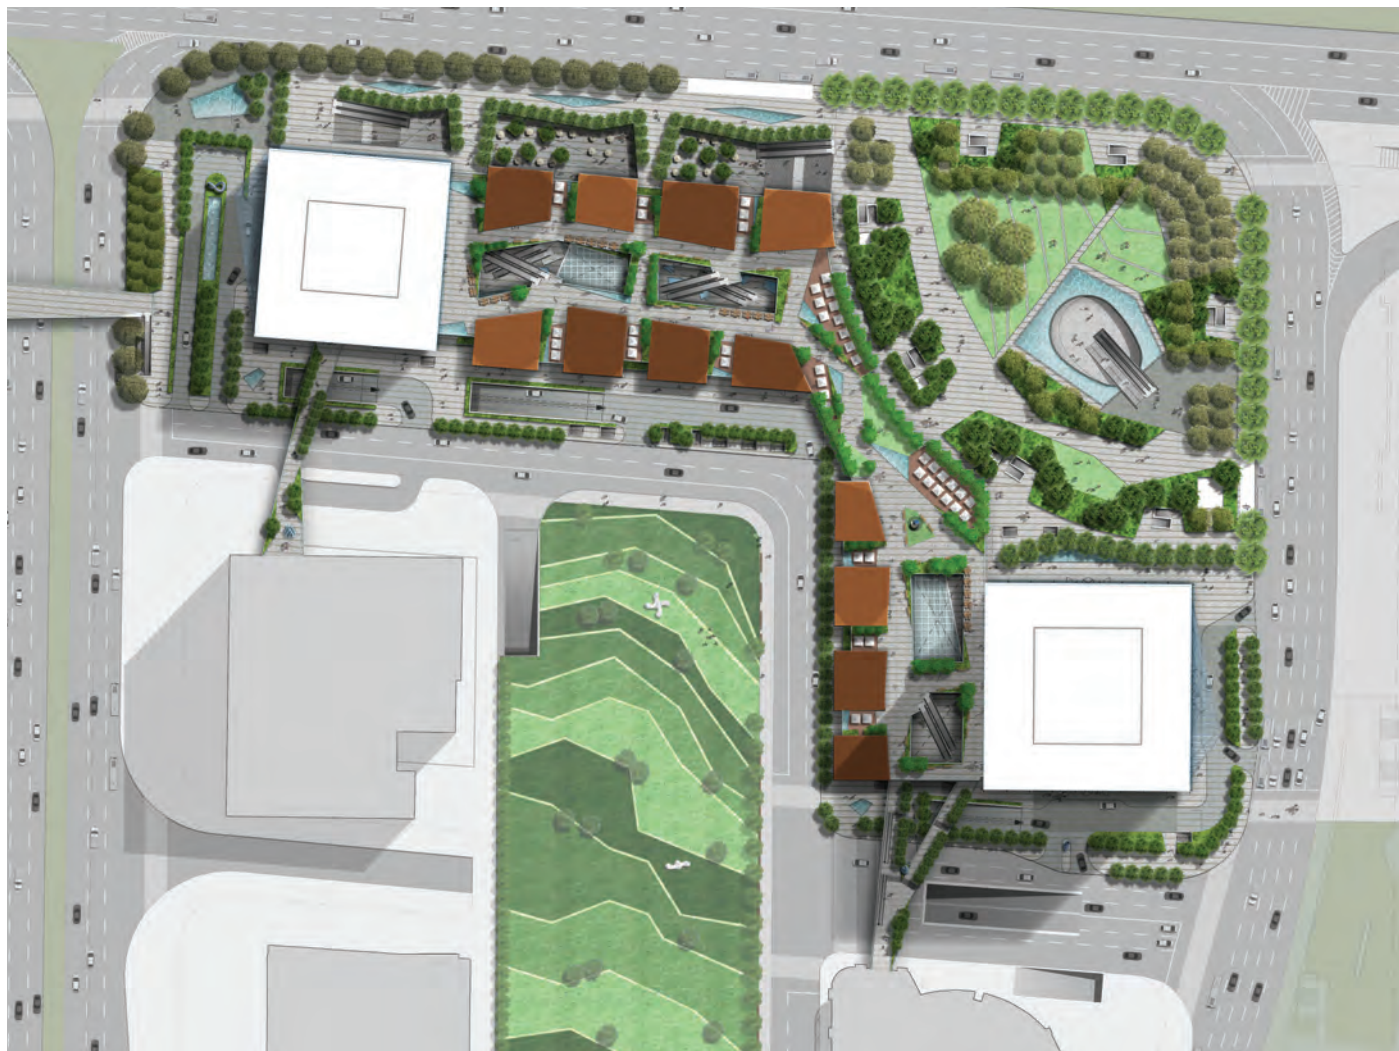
Zhujiang Plaza, Master Plan (Source: Arquitectonica)
